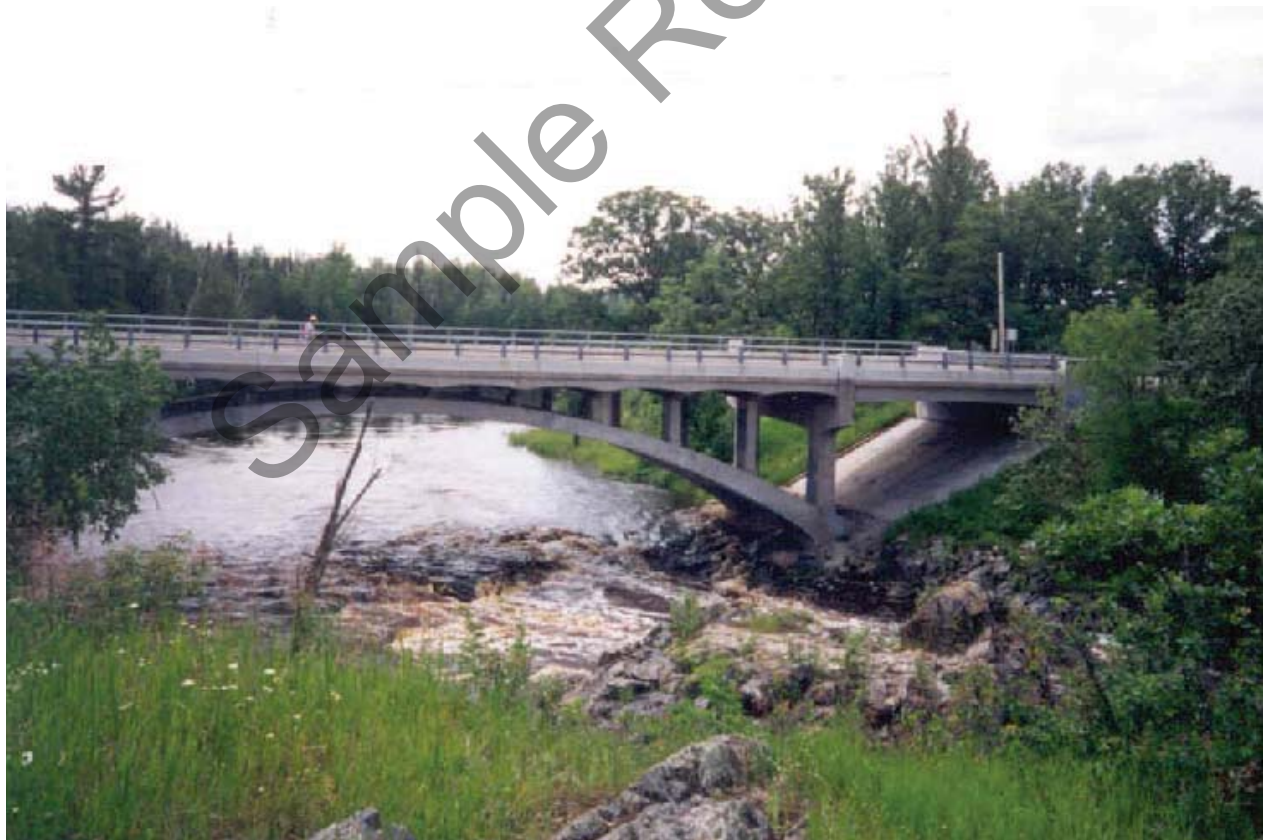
The existing three-span arch Bridge (5557) crossing Rapid River in Clementson
